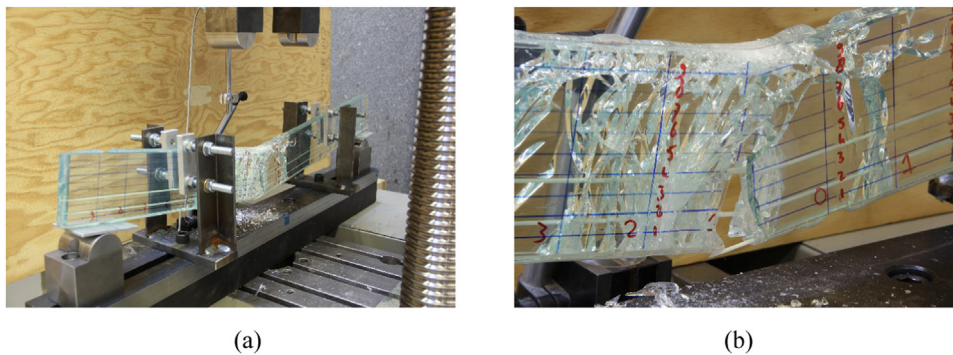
Failure configuration of the GFRP reinforced beams. (a) General view and (b) detail.
